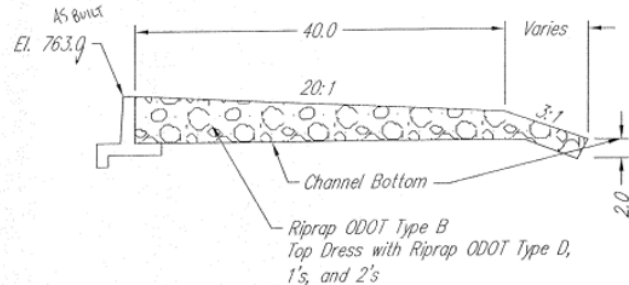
Blanchard River – Existing Inline Structure - (profile View)
